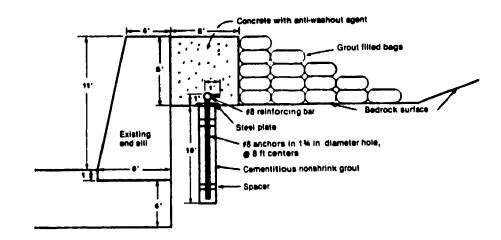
END SILL REPAIRS AT RED ROCK DAM USING CONCRETE WITH AWAs.<sup>57</sup>
